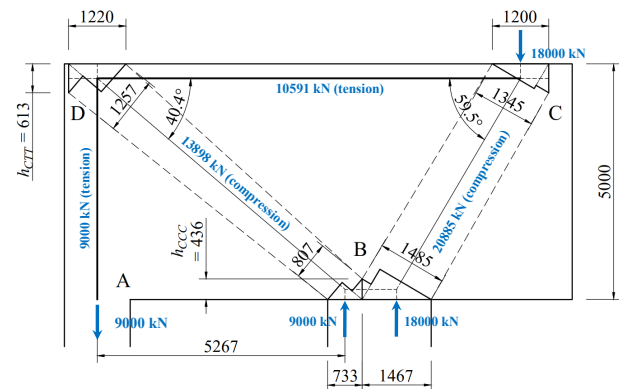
Dimensioning of the STM for the cantilever deep beam.
